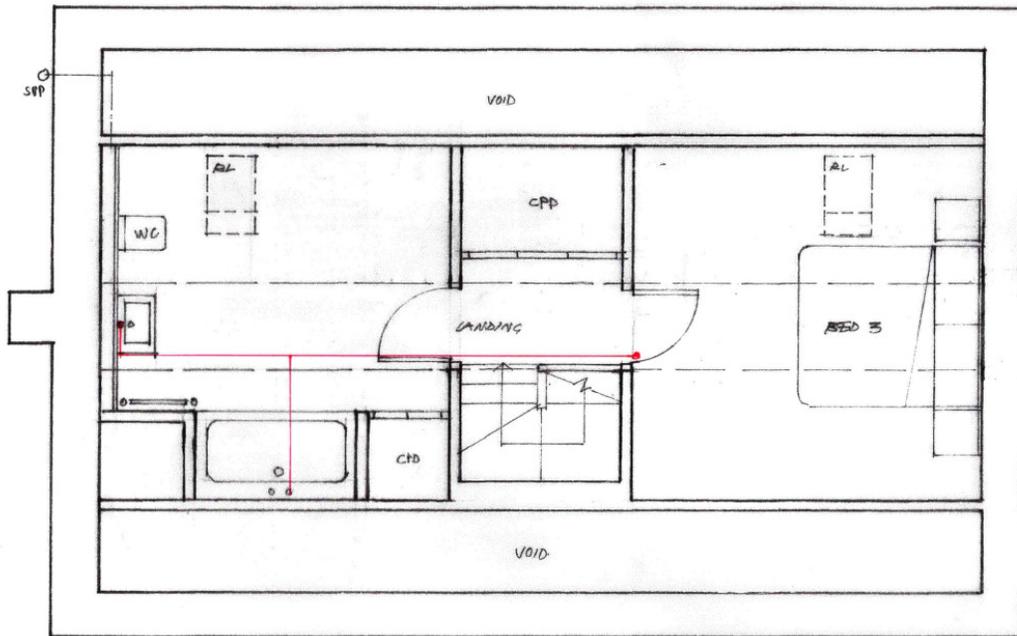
Attic Floor Plan. Drawing by Lacey Interior Architecture Ltd.
